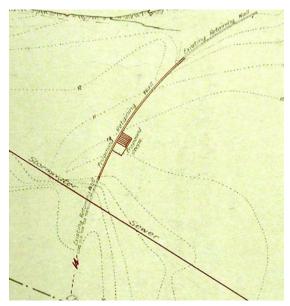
Part of a mid 1920s plan for Tamarama shows a proposed sea wall joining two sections of existing wall, with steps to the sand from a new promenade. Source: WLS photograph of original
